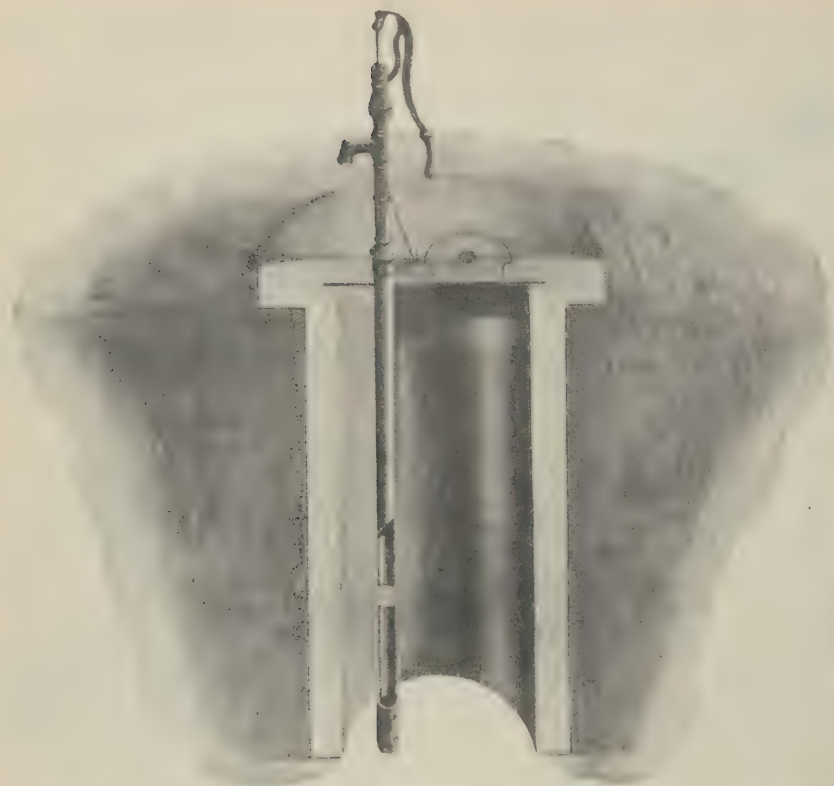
A protected dug well (Schematic). Concrete platform with manhole. Concrete casing.
